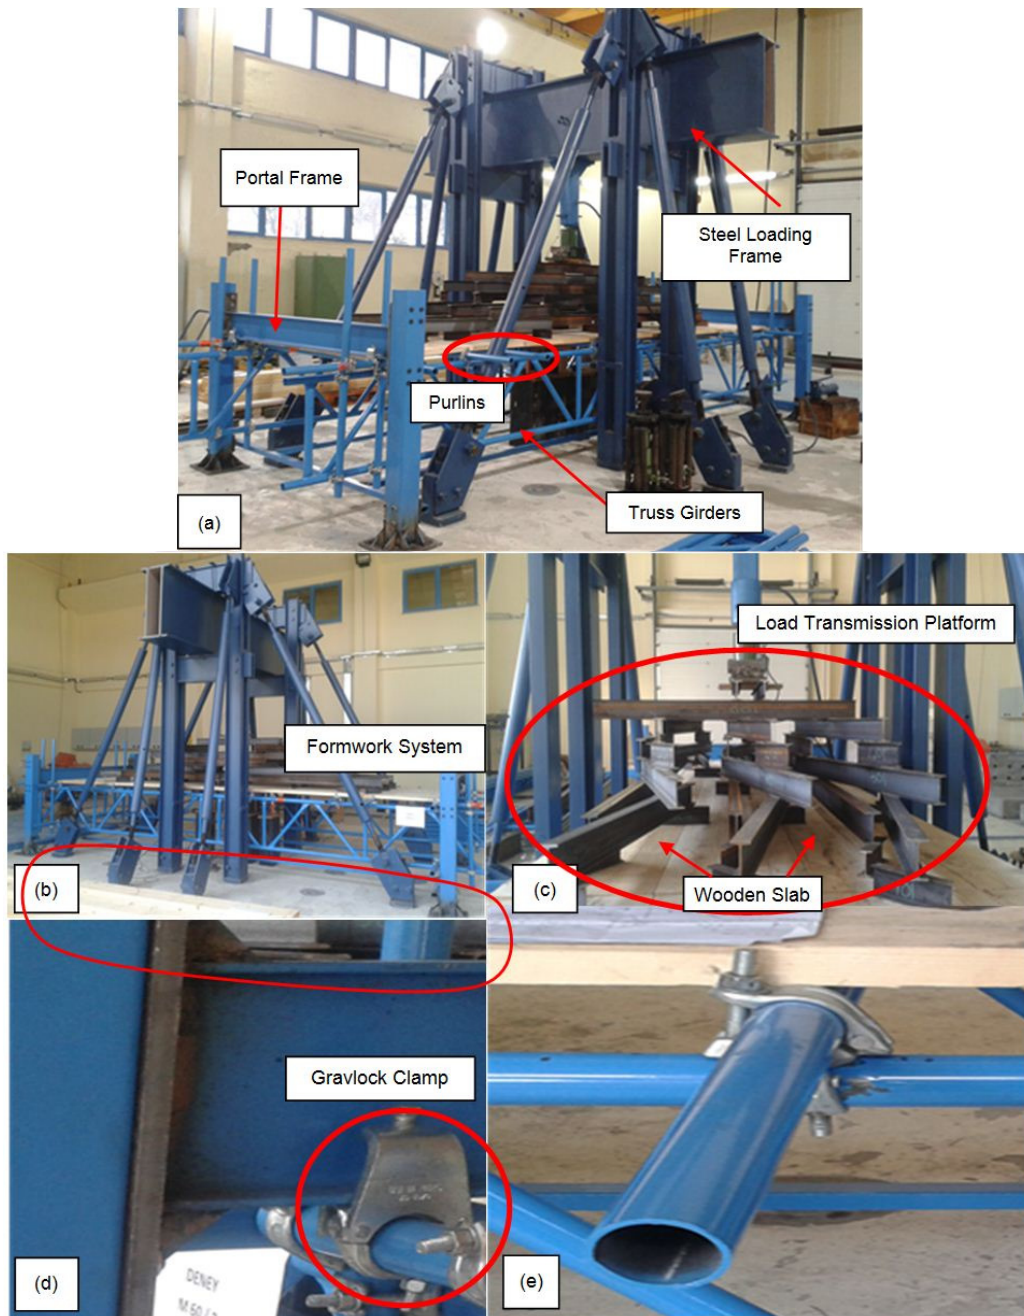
(a) Perspective; and (b) left side view of test set-up and steel loading frame; (c) front view of load transmission platform; (d) front view of pin-supported connection between truss girder and portal frame; and (e) left side view of pin-supported connection between purlin and truss girder
